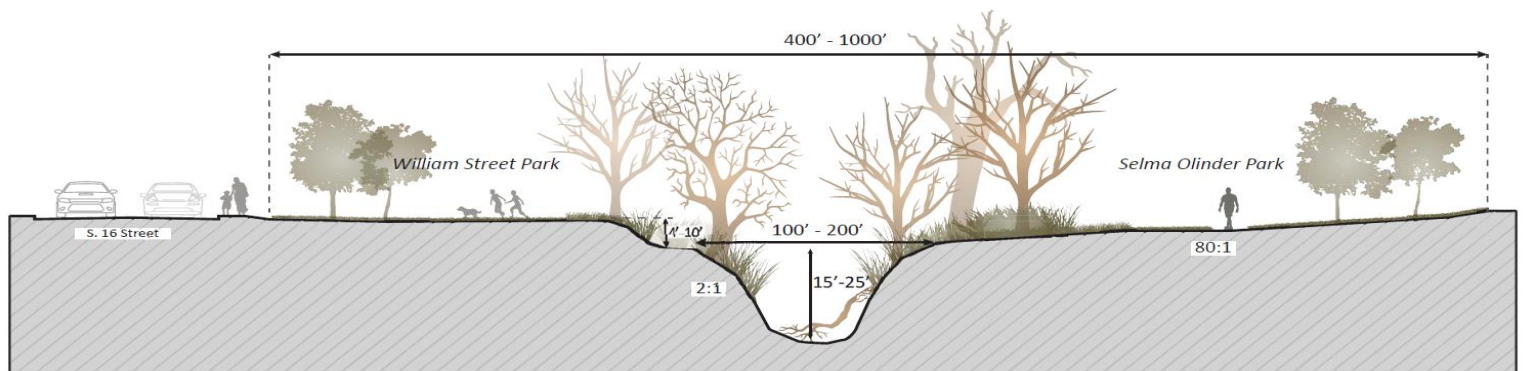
Typical Reach 7 cross-section (south half), looking downstream
